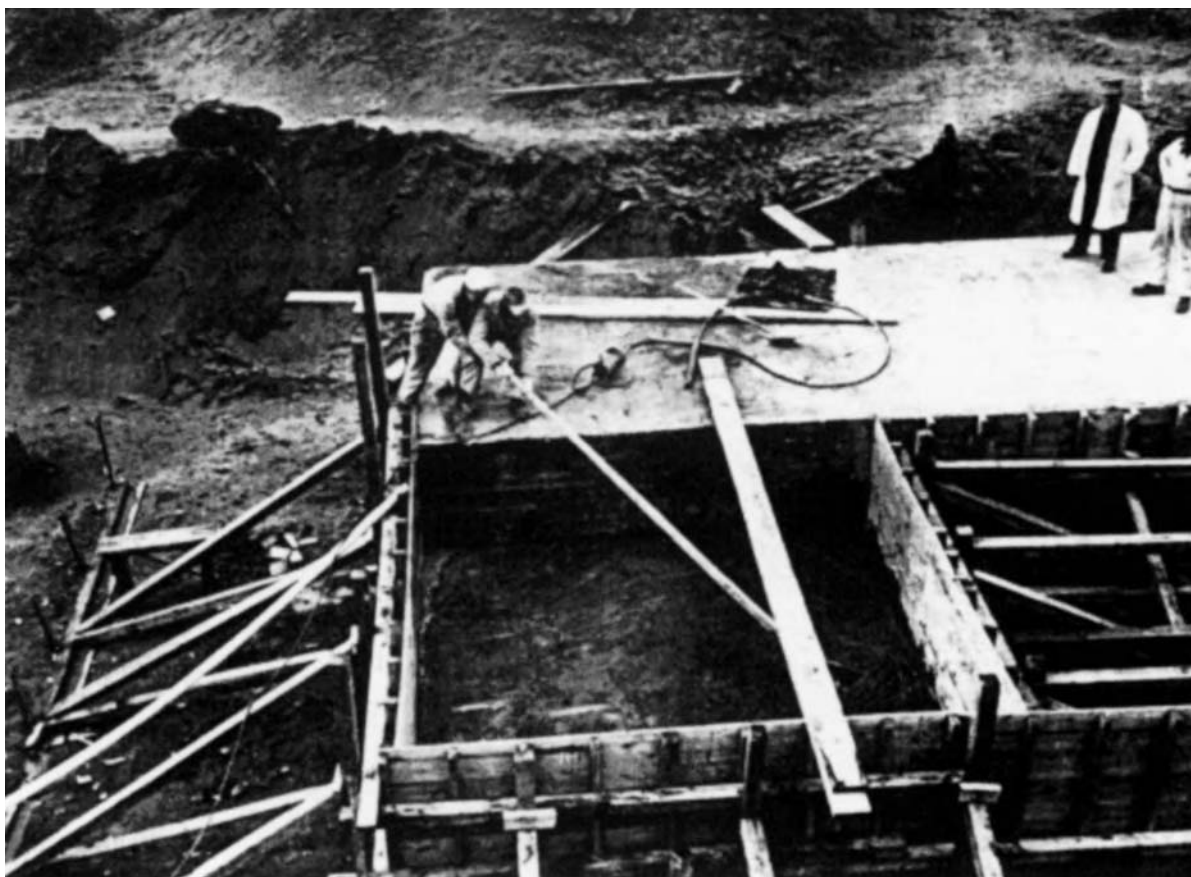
Pouring a concrete monolith. Steel drums filled with waste, solidified by mixing with cement, were stacked on concrete slabs surrounded with forms. The forms were filled with concrete. The monoliths were about 2 m below ground level.
